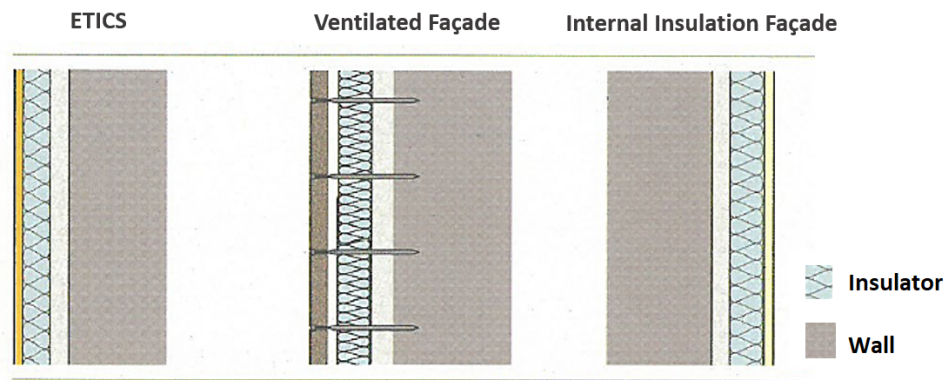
Constructive details of the façade systems, adapted from [8]
